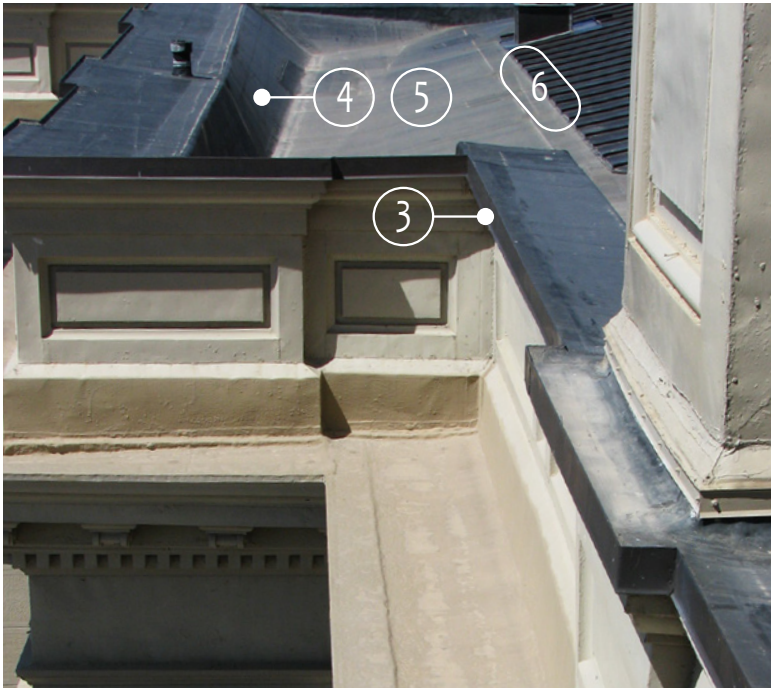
Roofing Components Identified in the Photograph at the Fascia, Back Face of the Parapet, Built-In Gutter and Transition Between the EPDM Gutter and the Copper Standing Seam Roof.
